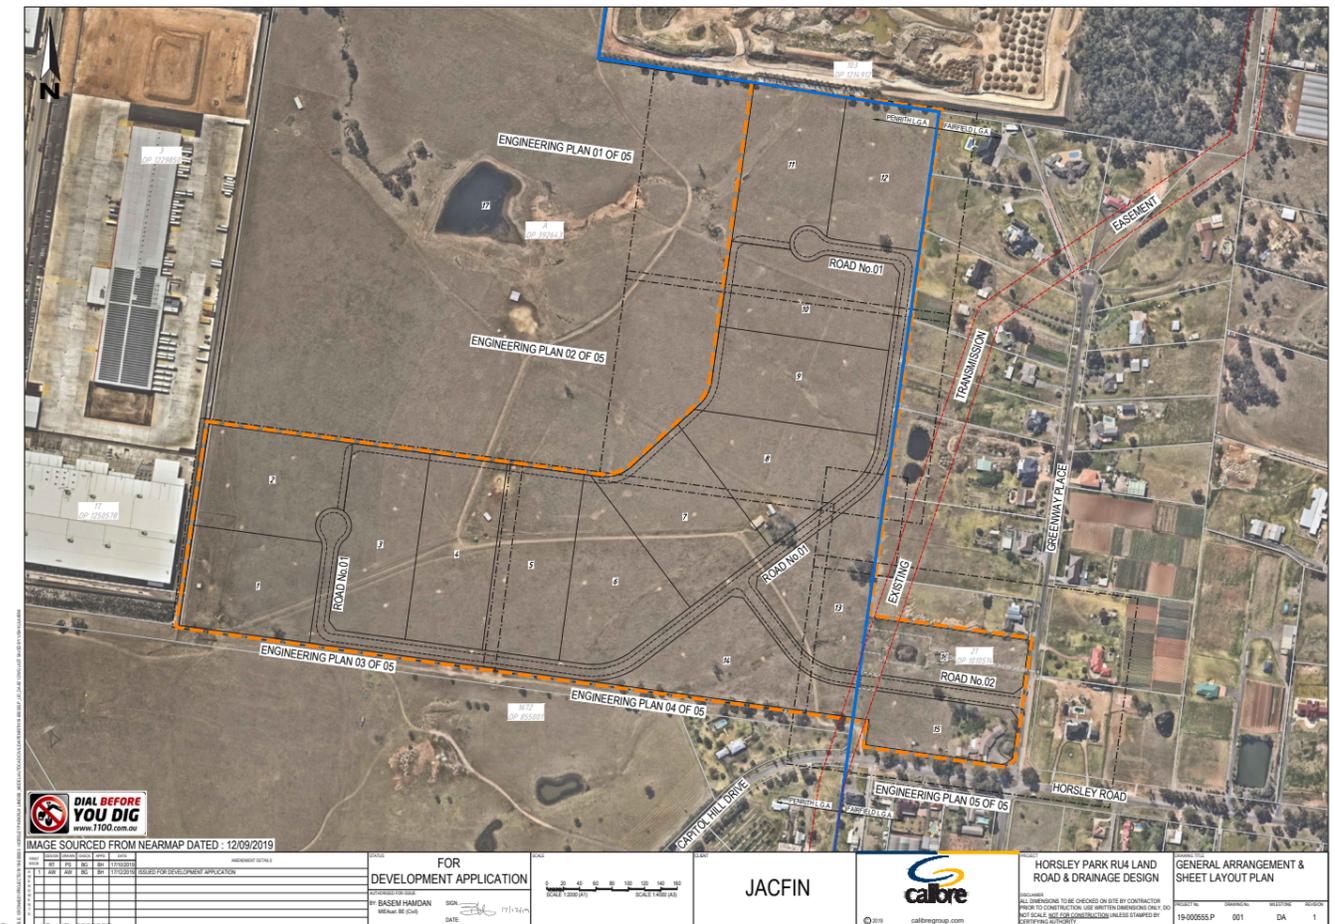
Jacfin Horsley Park Project - Horsley Park RU4 Land Road & Drainage Design (Source: Calibre)
